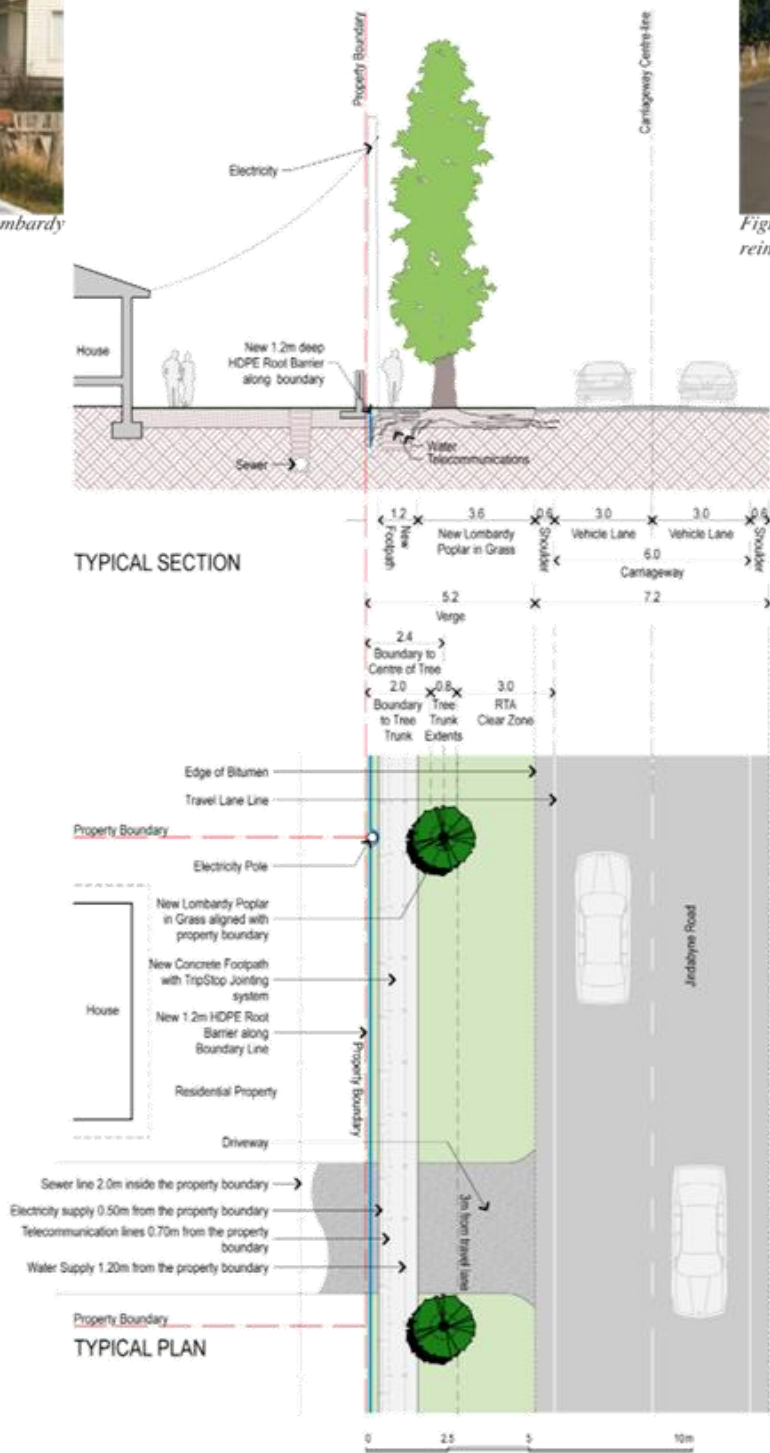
OPTION 1 - Typical section and plan with the replanting of the Lombardy Poplar and the installation of a root barrier along the property boundary
